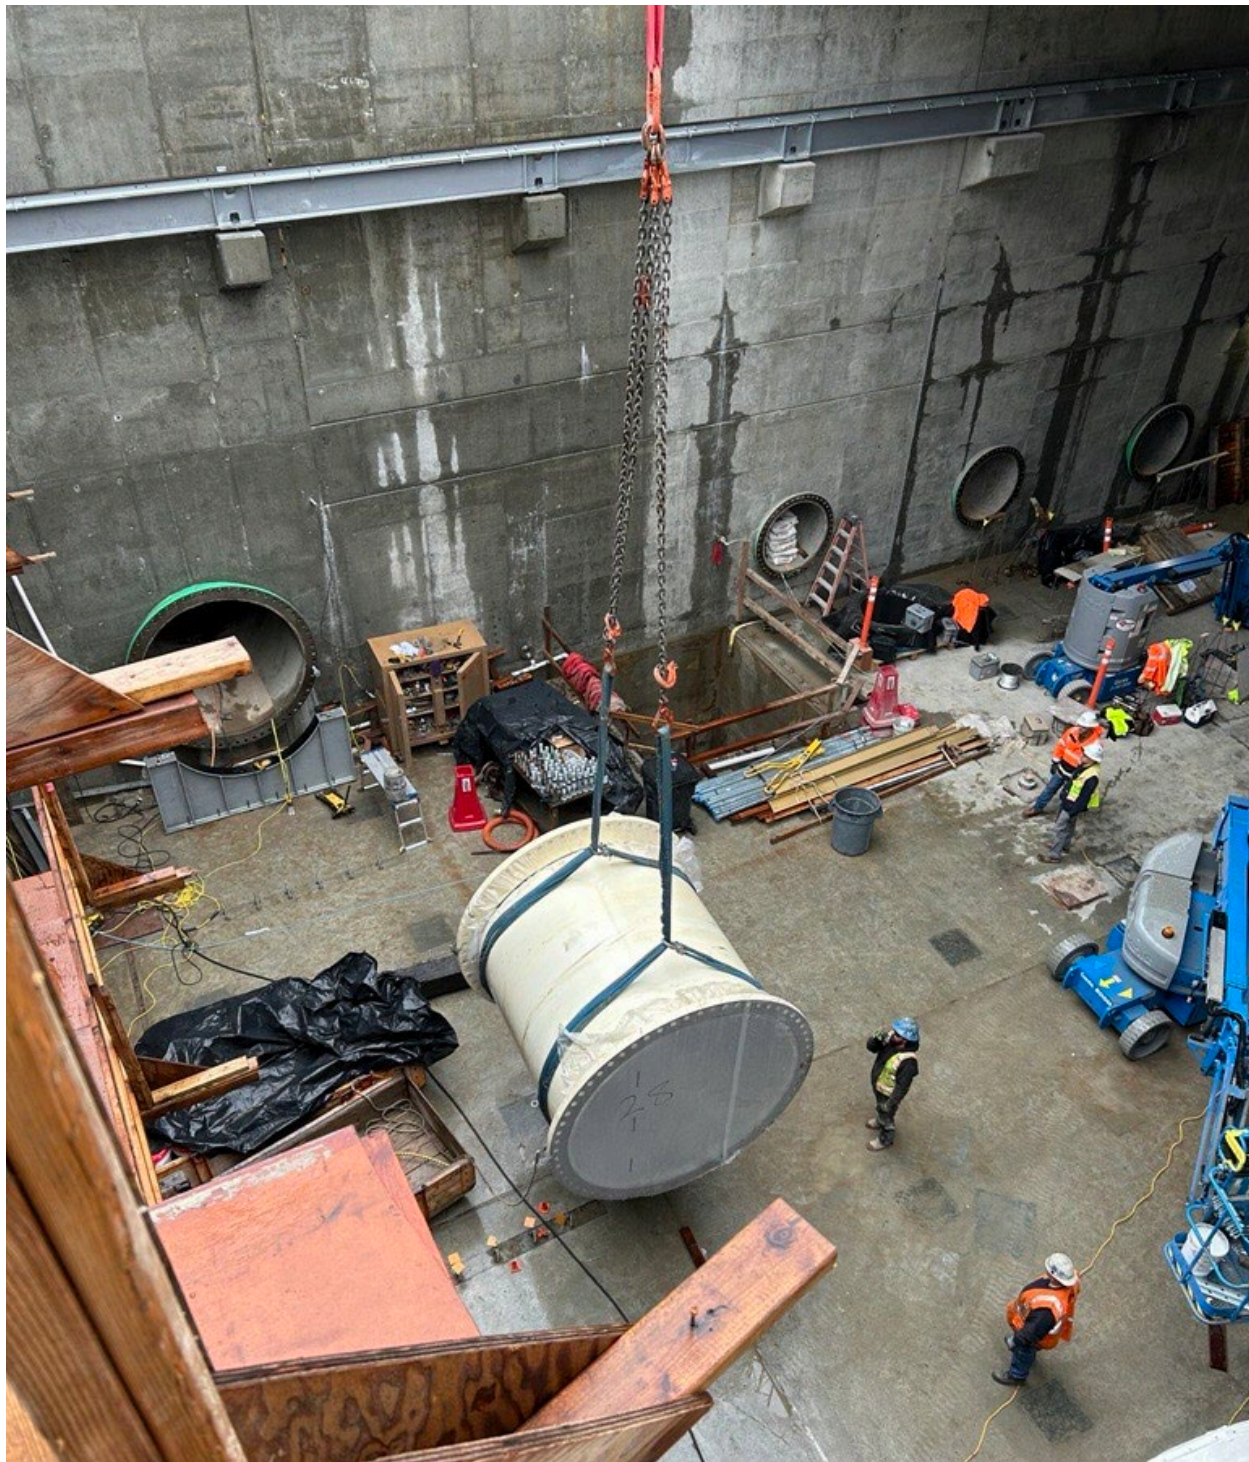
Crane lowering 84-inch steel bypass piping into the UV Room with the aid of workers serving as spotters.
